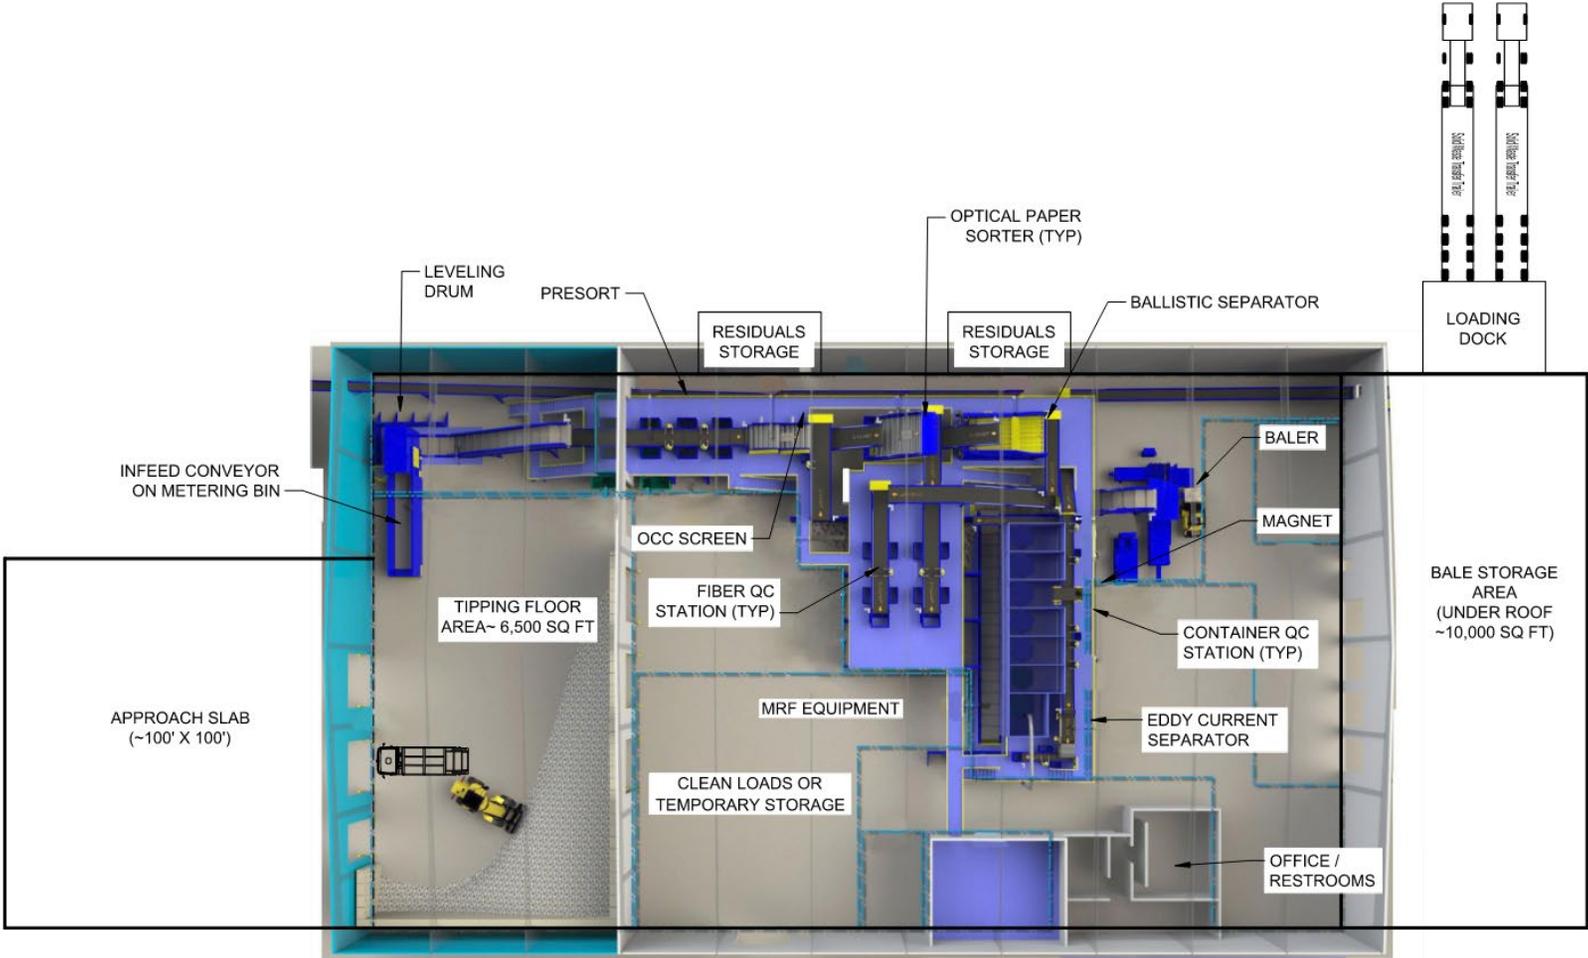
Example 1 MRF Floor Plan (10 TPH or Less)
